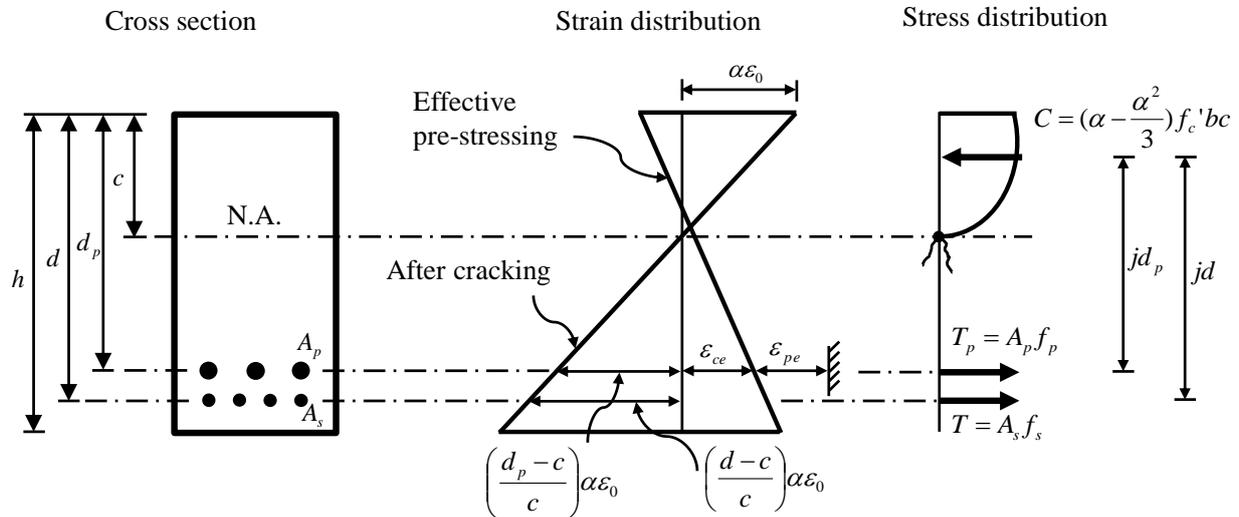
Strain and stress distributions in cross section of pre-stressed concrete beams
